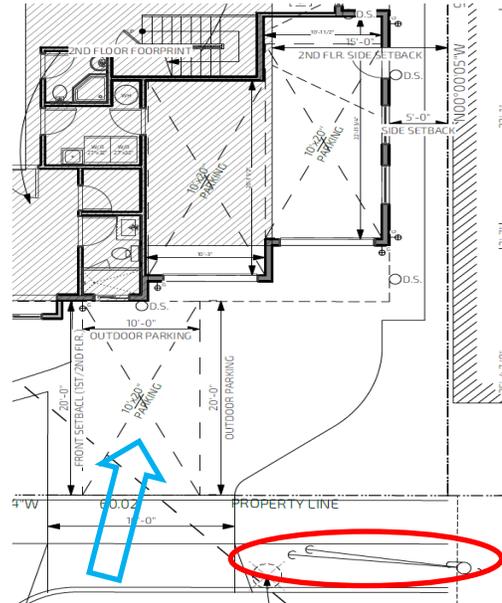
Driveway along Lomita Avenue showing the location of the garage spaces, the driveway (blue arrow), and the power pole with guidewires
